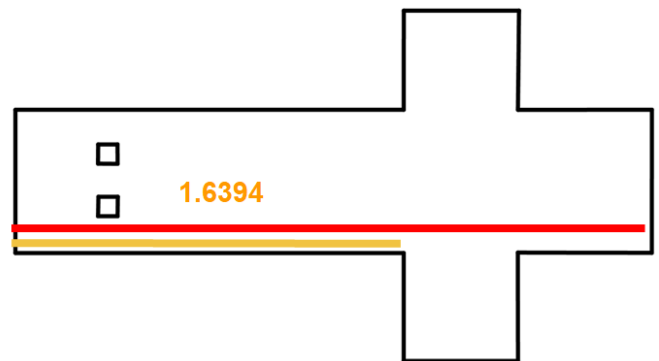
Golden ratio found on the floor plan of Pan-ay Church
